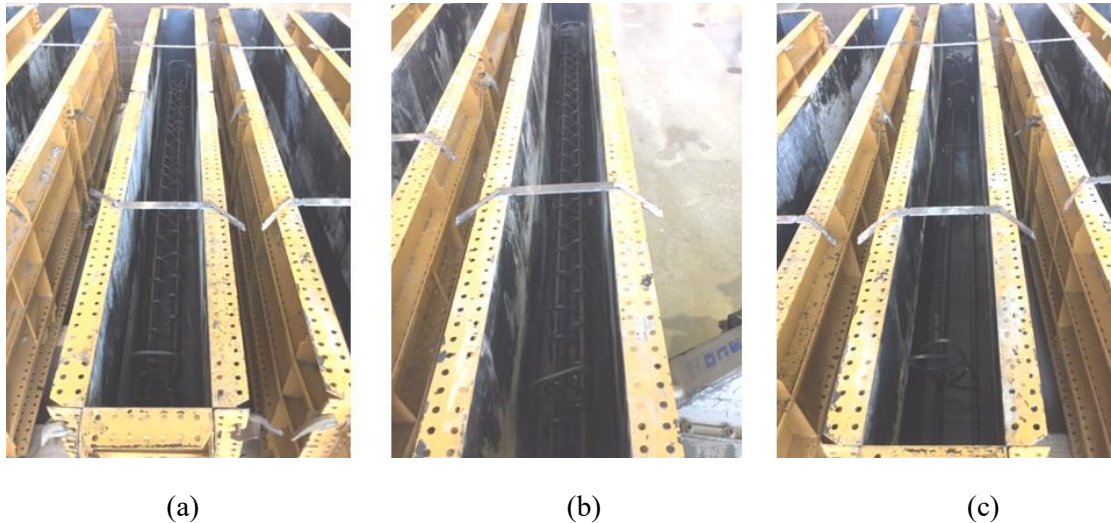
The reinforcement arrangements formwork: (a) under-reinforced; (b) over-reinforced; and (c) shear failure beam.
